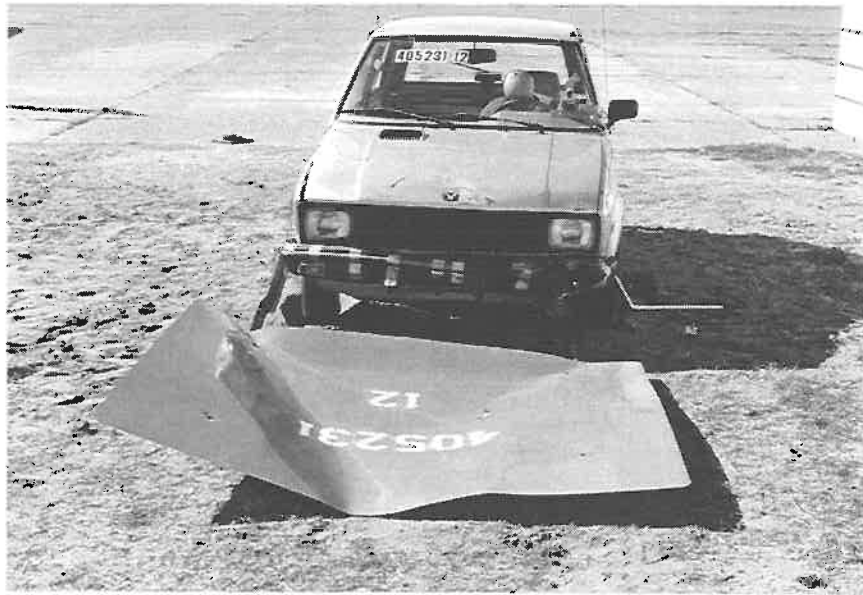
Final rest position of the sign installation and vehicle (test 405231-12).
